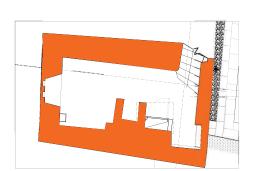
Ground Floor plan of Bannister House (based on proposal drawings showing the new Pembroke College development)
